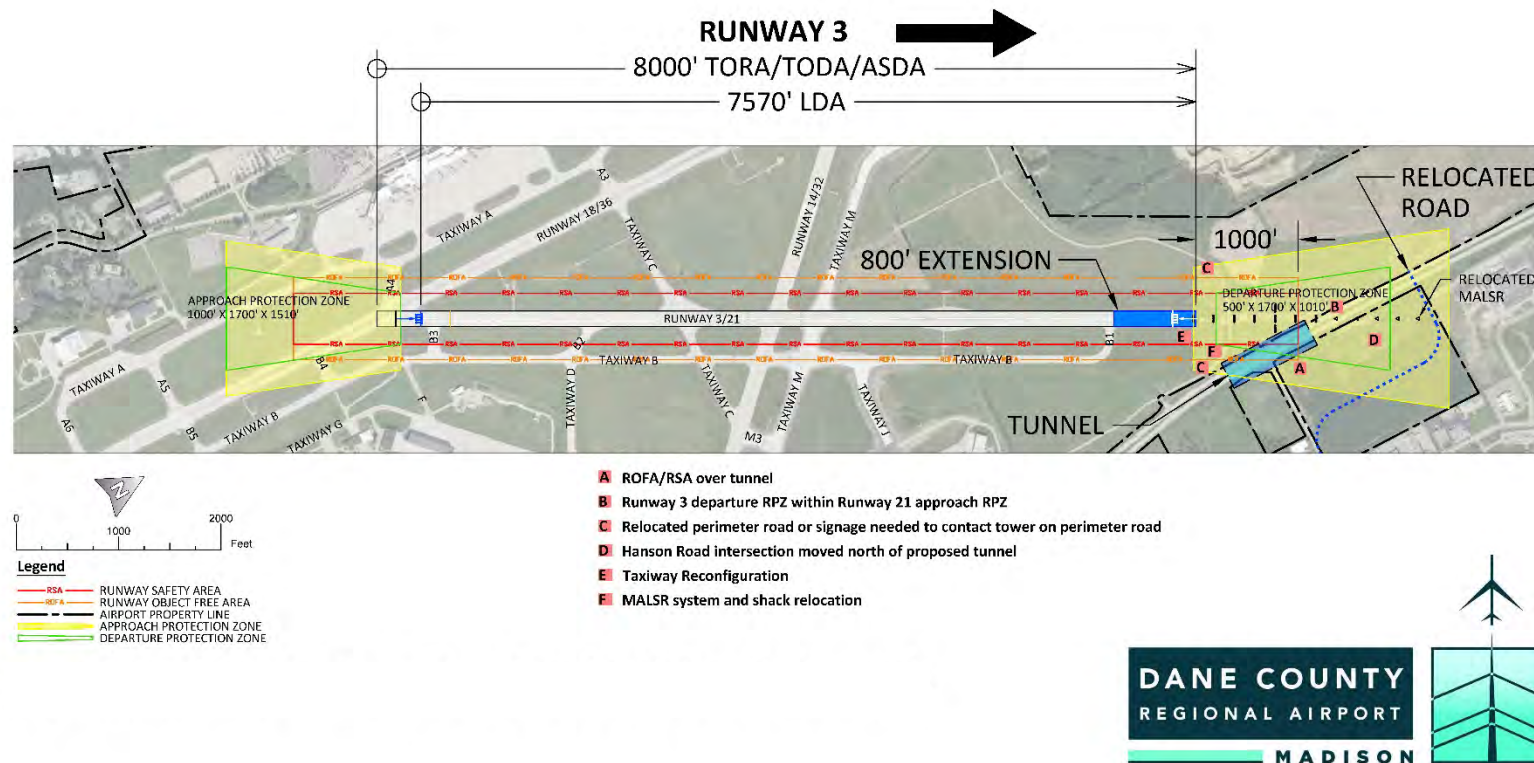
Alternative 3 – Extend Runway 3 North with Tunnel
